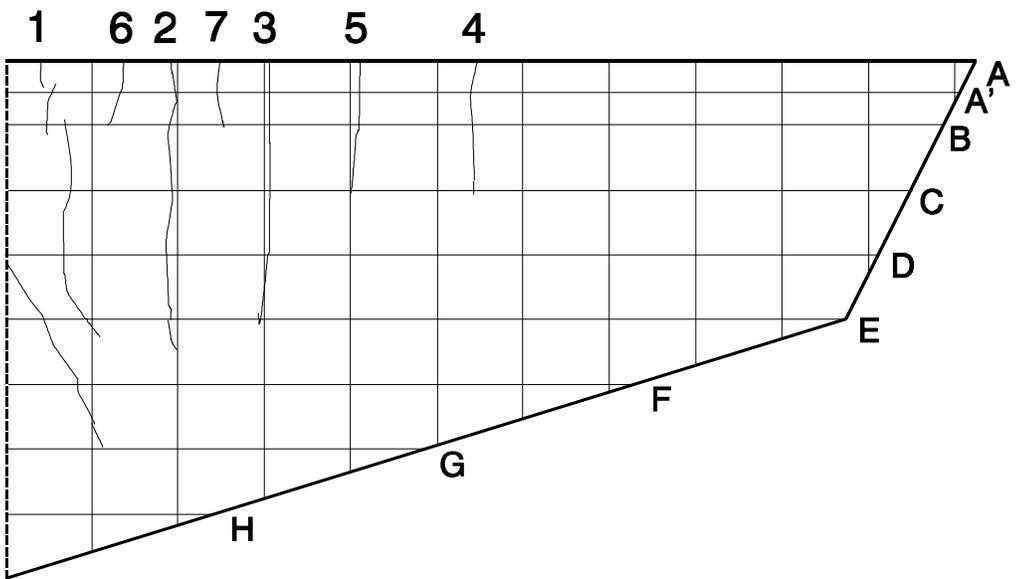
POJ-RC-100 cracking pattern on north face of overhang at service load
